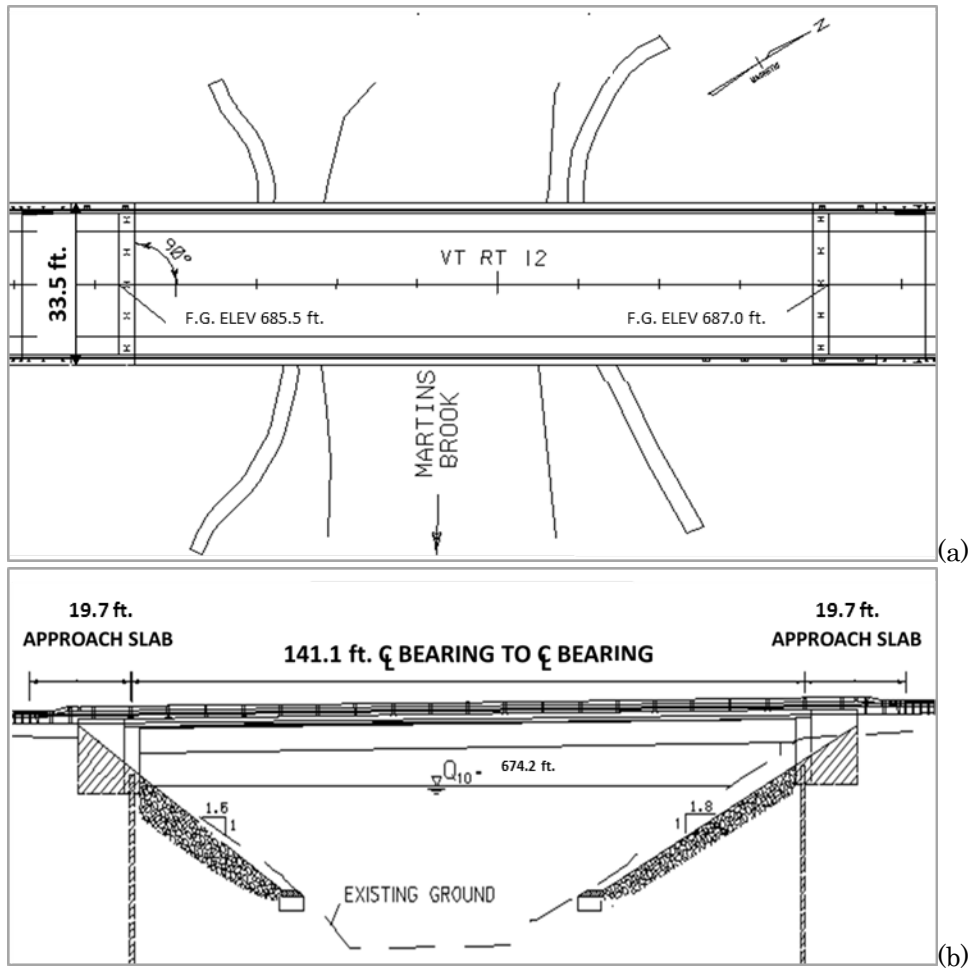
Middlesex Bridge (a) plan view (b) elevation view
